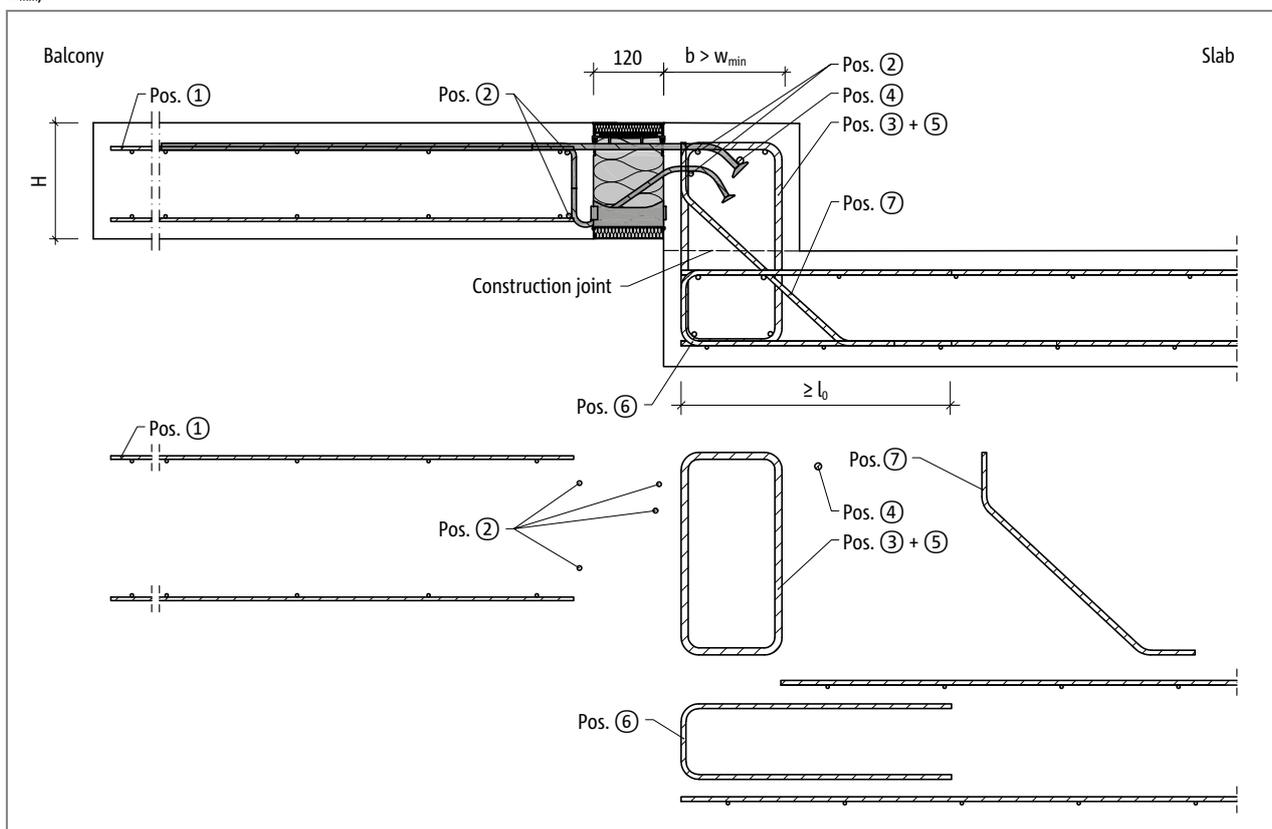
Schöck Isokorb® XT type K-O: On-site reinforcement for balcony with height offset upwards with larger structural element dimension ( $w_{vorh} > w_{min}$ )
